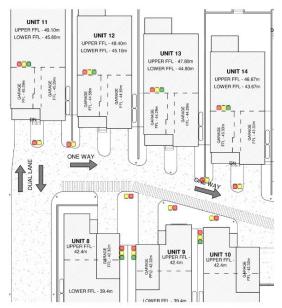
example of bin storage and bin collection points (source: EcoResults, 25/05/2024)
